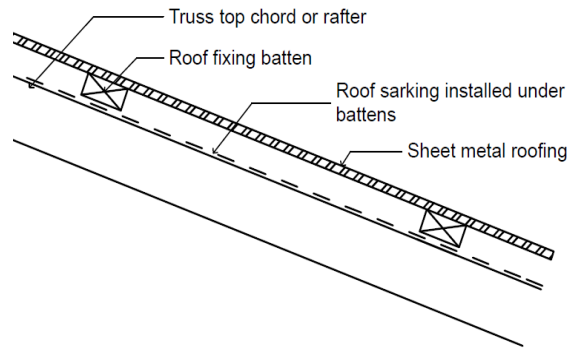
Method for test cells – Sarking installed over rafters, under battens
